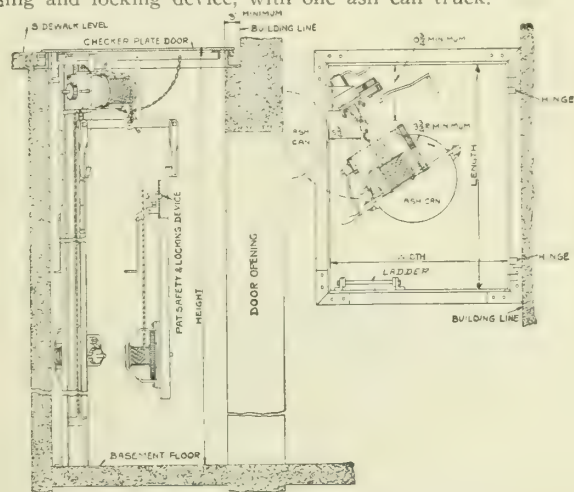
ELEVATION AND PLAN OF ERNST COMBINATION TELESCOPIC ASH HOIST AND SIDEWALK DOOR WITH DOOR OPERATING DEVICE
